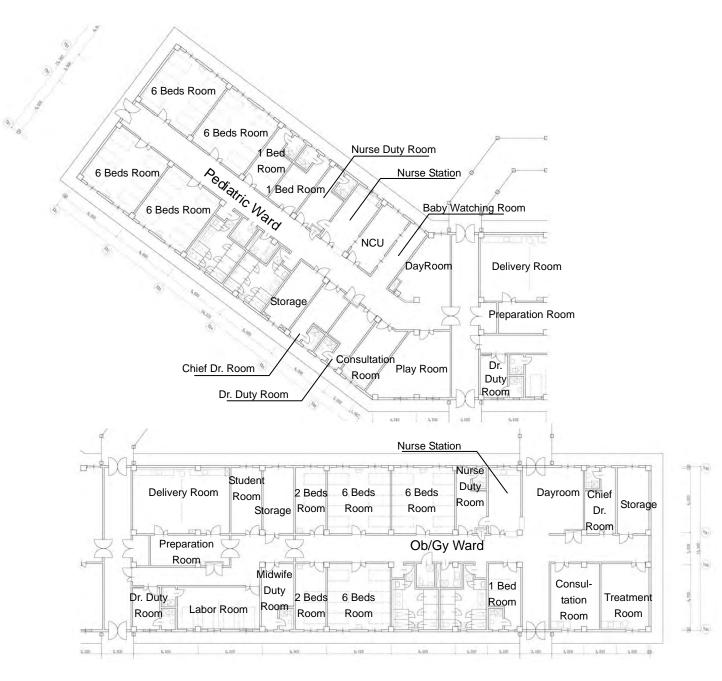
Ob/Gy & Pediatric Ward Building Plan Scale: 1/250
